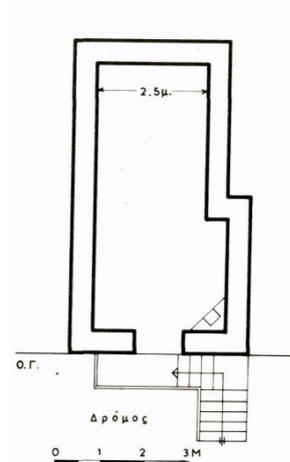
Typical floor plan of a Cycladic house “*monochoro*” (261)
